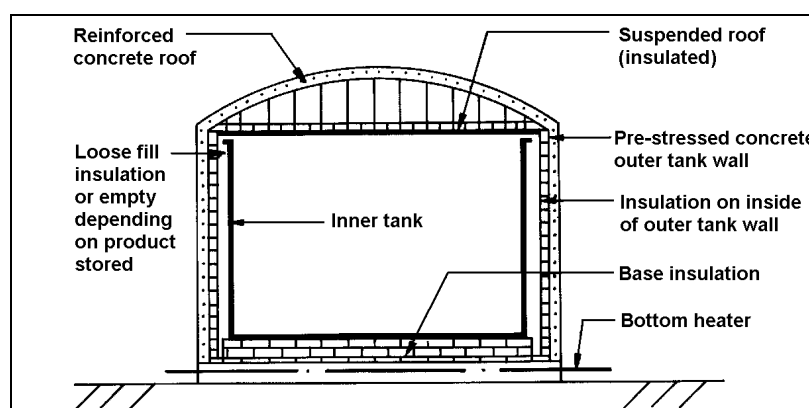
Typical example of a full containment refrigerated tank [EEMUA Pub 147]
